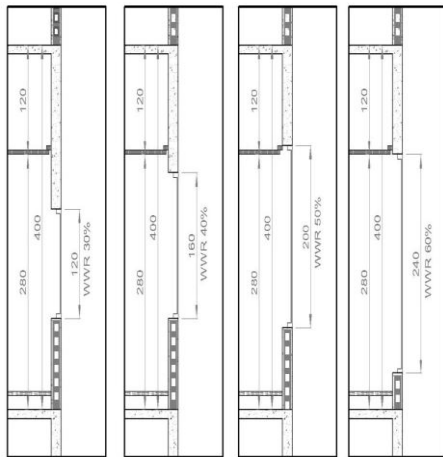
Schematic sections of window-to-wall ratio modeling strategy.
